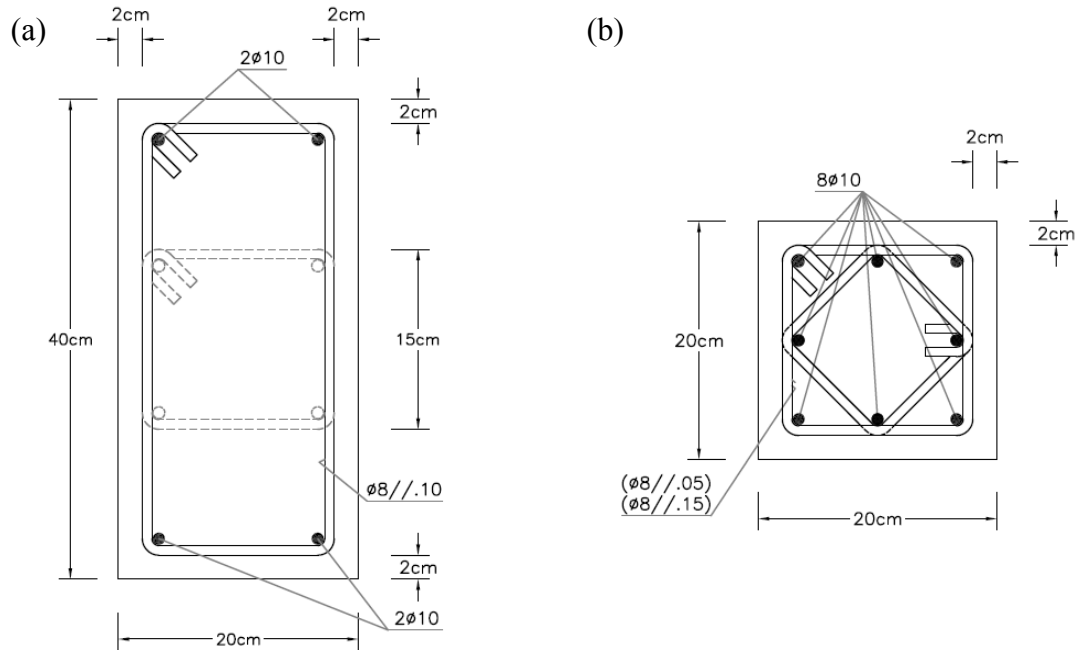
(a) Beam and (b) column section details of Lisbon 3D frame model B (taken from: 15th WCEE Blind Test Challenge Report, 2012)
